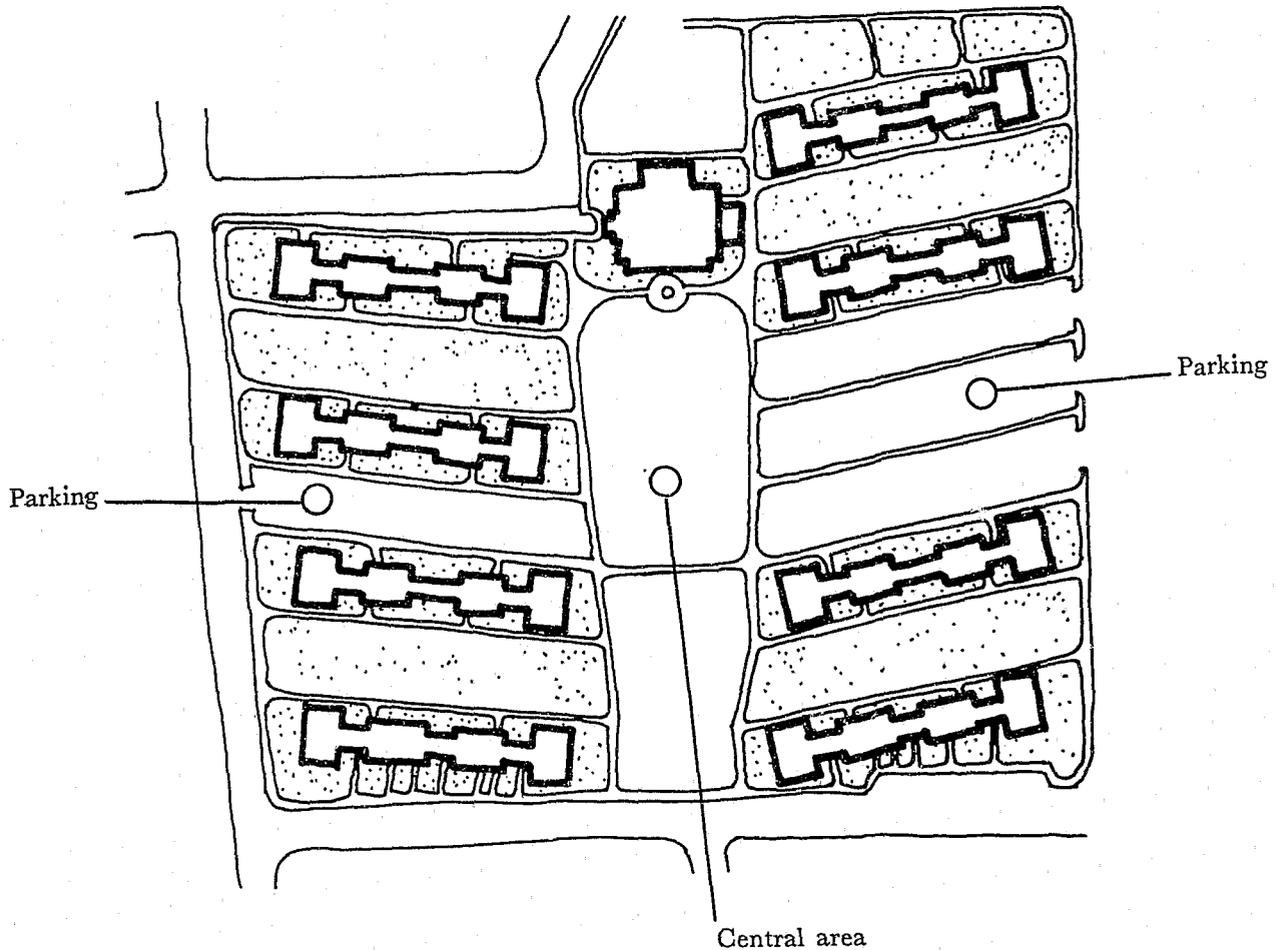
Columbus Homes, Newark. Site plan.
